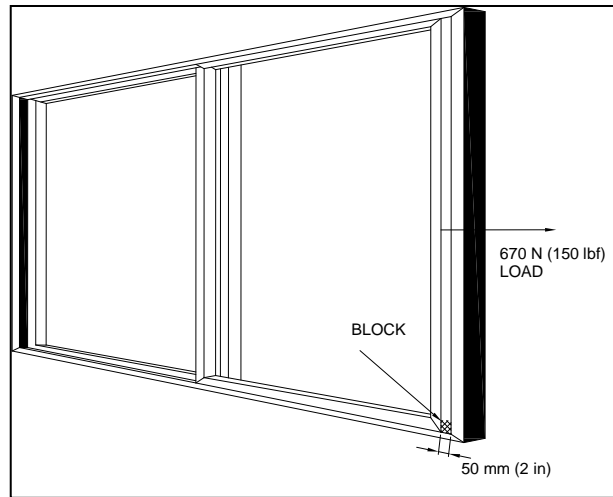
Sliding Sash/Door Panel Corner Block Test
